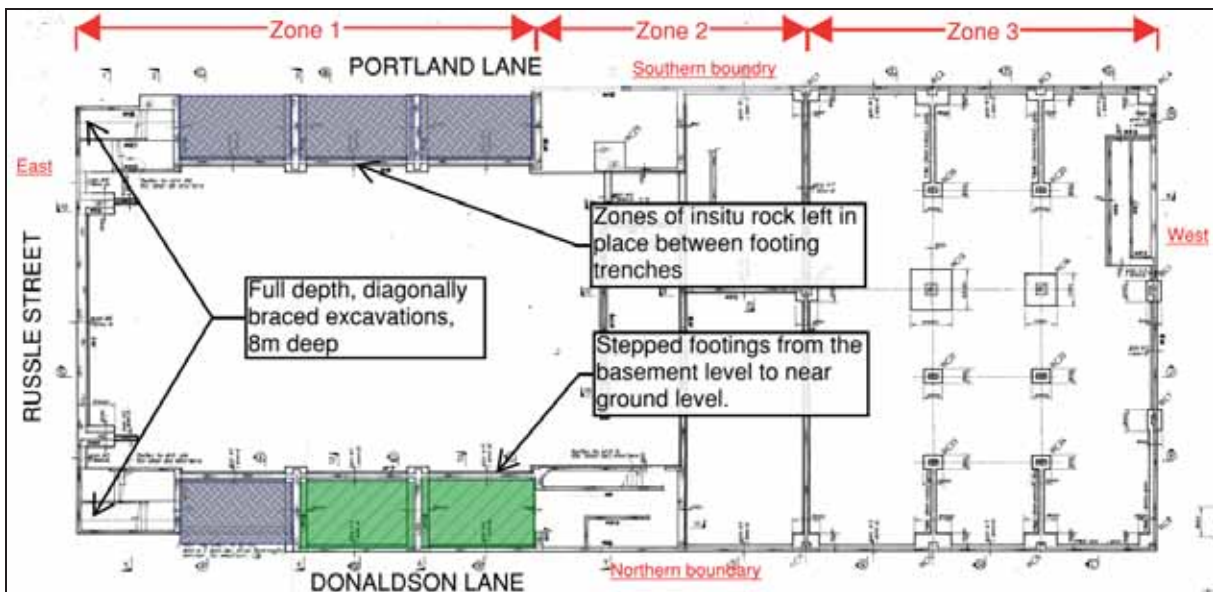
Existing building foundation layout plan with zones of insitu rock and stepped footings on the sides of the deeper part of the excavation in Zone 1 (Note the orientation of this figure is the opposite of Figure 1).
